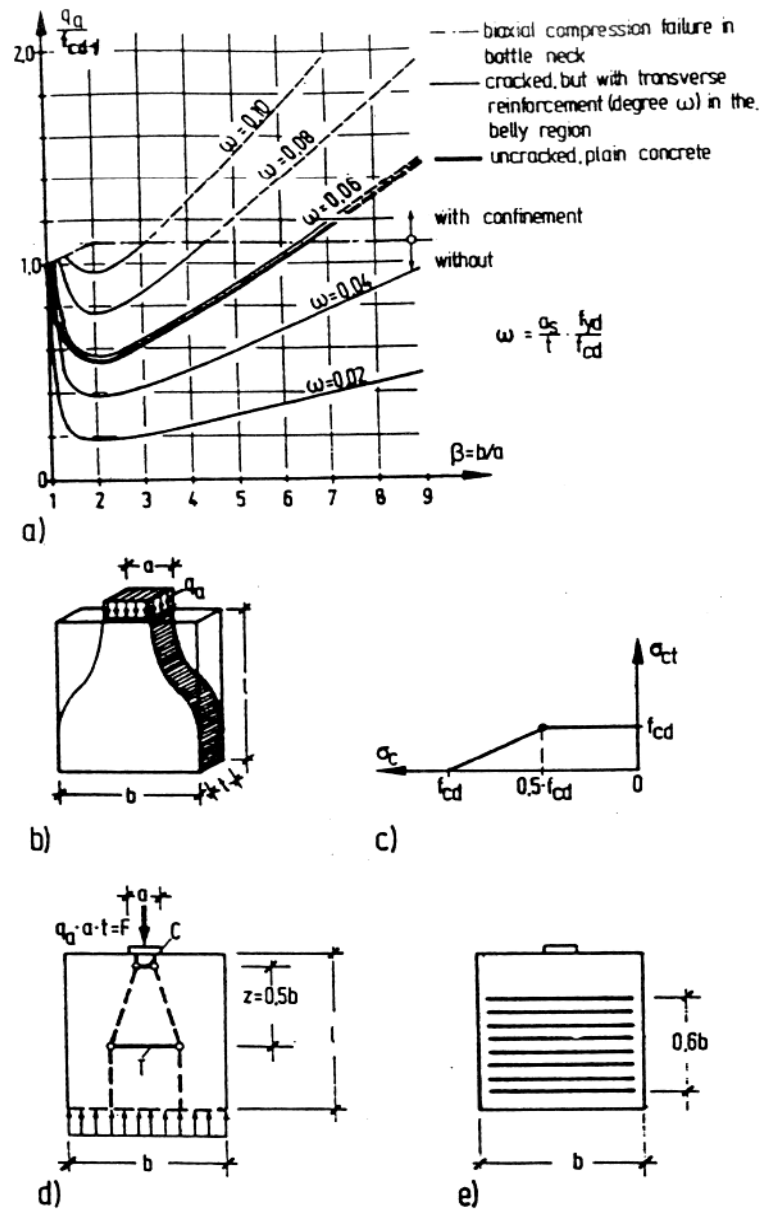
Bold curve in showing the plain concrete a) confined to the width b) bottle shaped stress distribution c) two phases of concrete strength d) STM model e) reinforcement layout [1]
